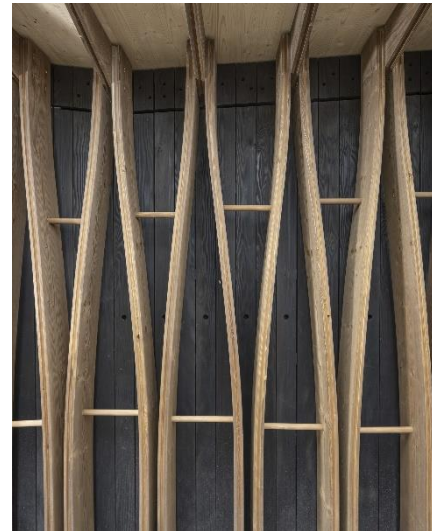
Back entrance of the pavilion, with shown gap underneath the construction
